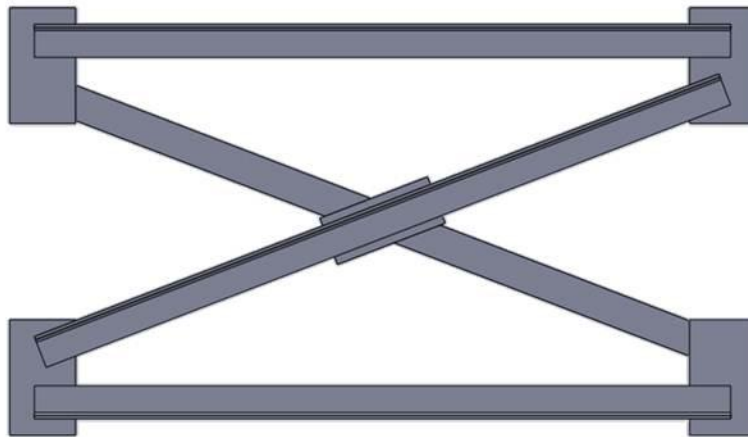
Typical X-type Cross Frame with Steel Angles
